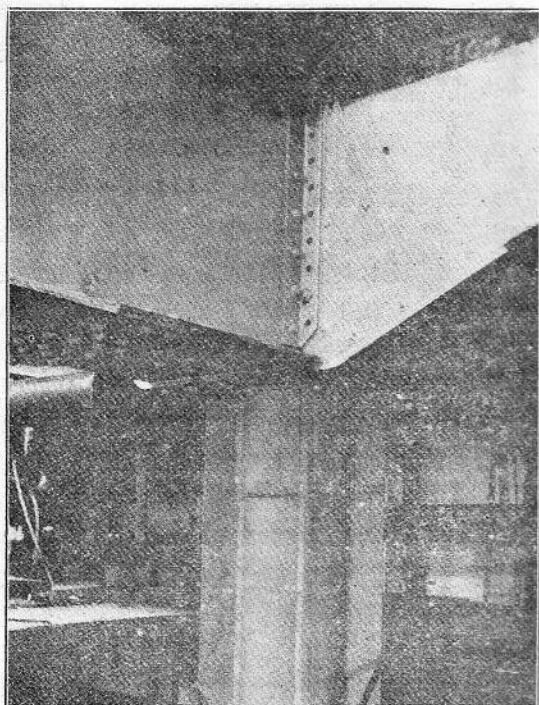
12-inch Pipe Stanchion with Welded Ribs and Welded End Connection.
